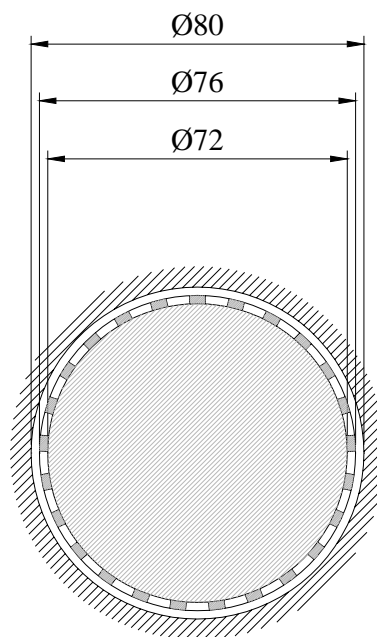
Assumed geometry of the plugged borehole. Borehole diameter 80 mm, perforated copper tube diameter 76/72 mm.
